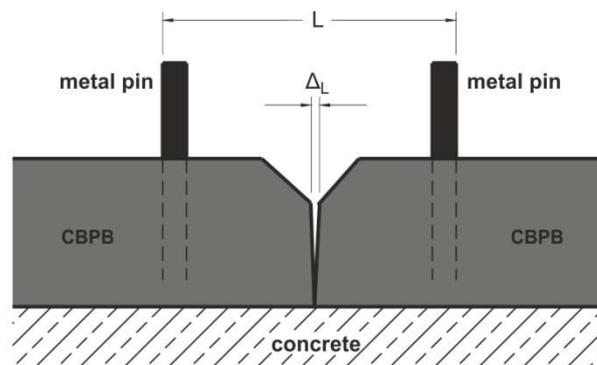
Setup for the measuring of the crack opening in the board joints.
